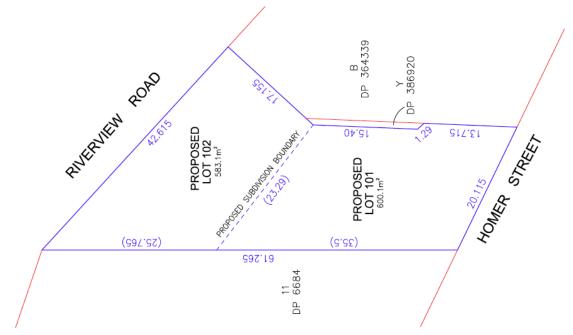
Subdivision Plan. Source: RGM Property Surveys
